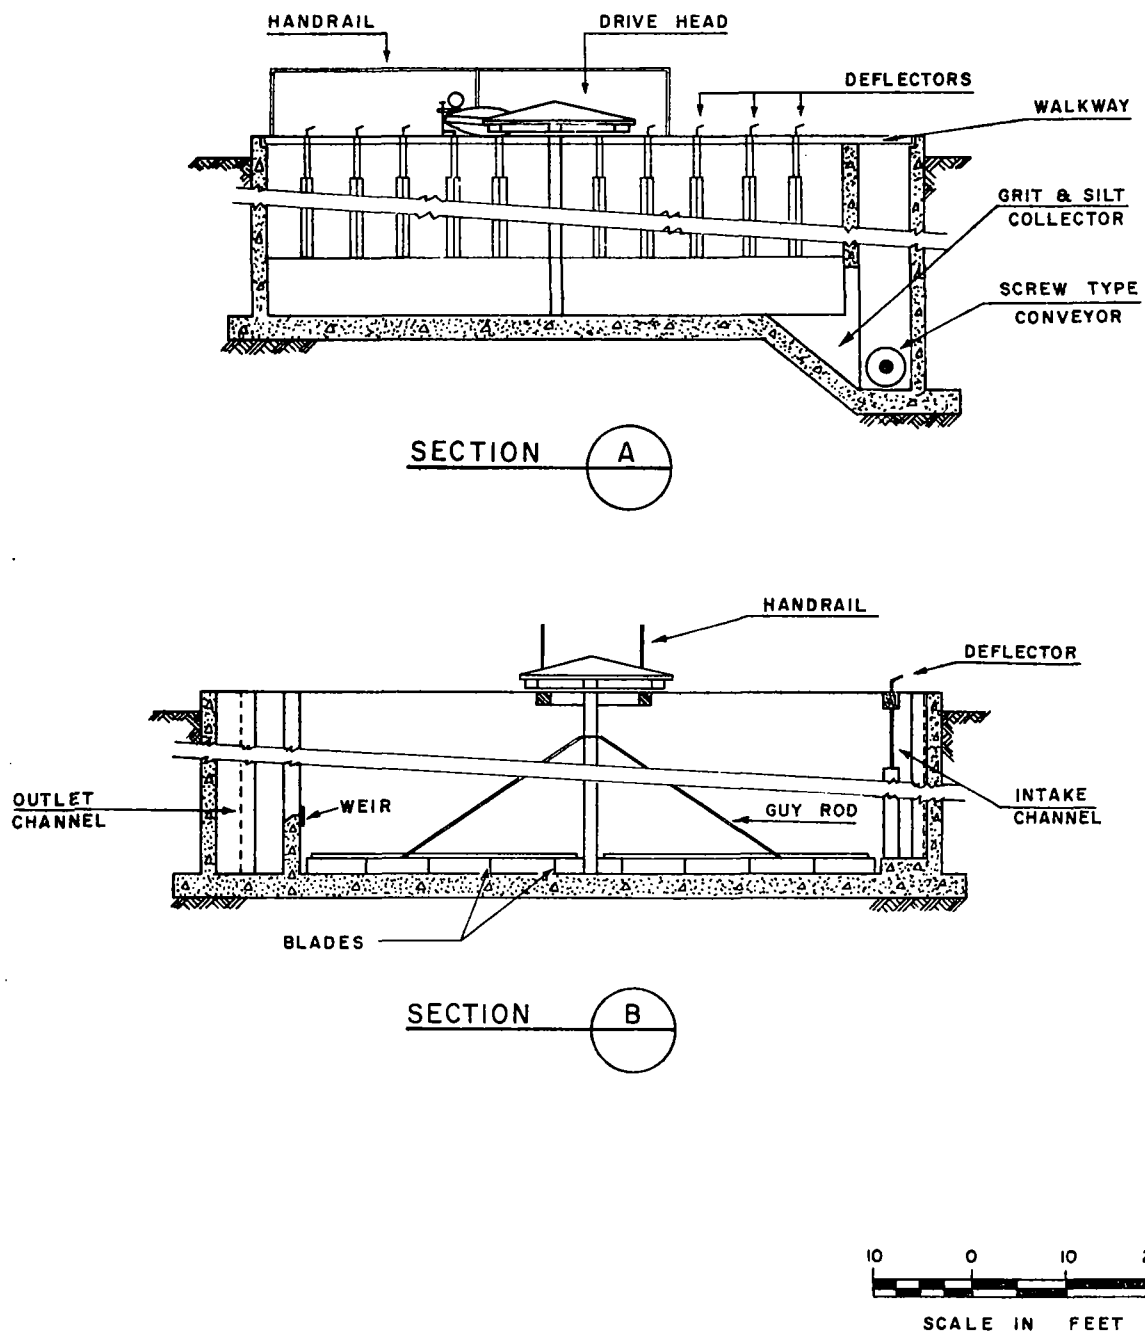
SECTIONS — SAN RAFAEL DEGRITTER
